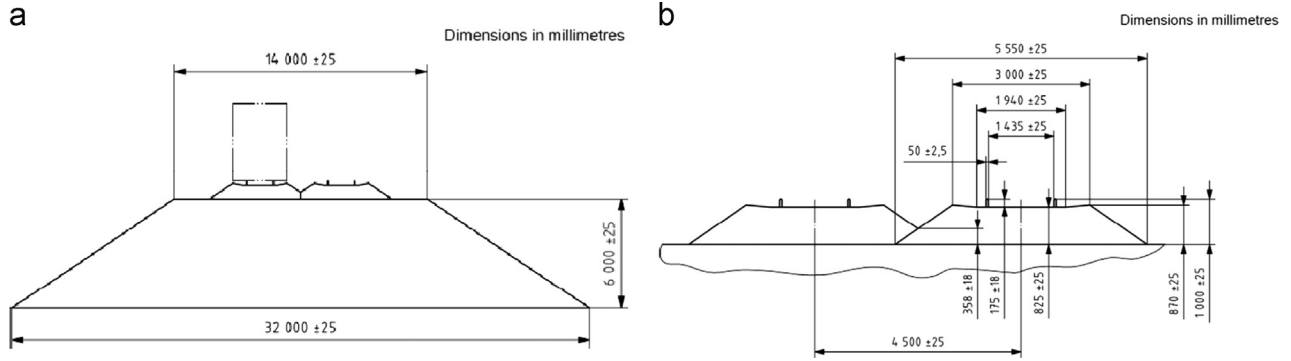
Embankment (a) and double track ballast and rail (b) layout (TSI HS RST, 2008).
